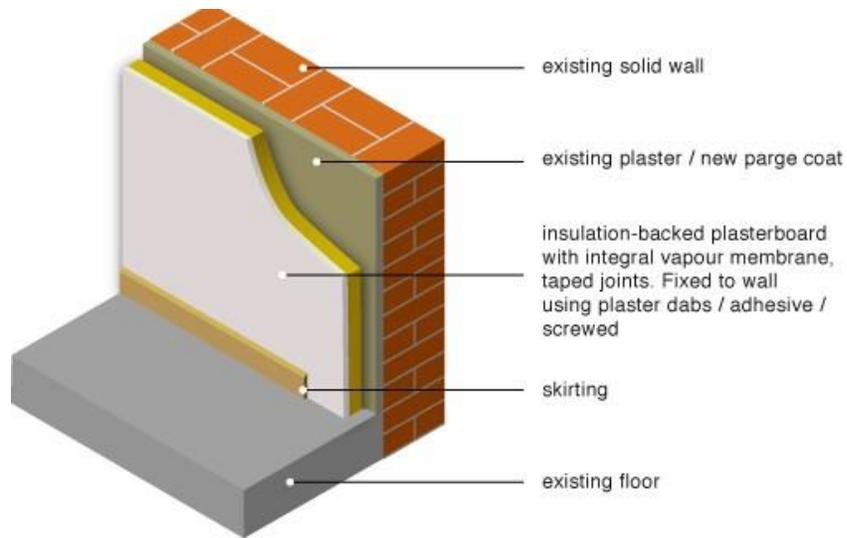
Insulation of internal walls with insulated plasterboard. (Source: www.greenspec.co.uk building design), (Chinazzo, 2013-14)
